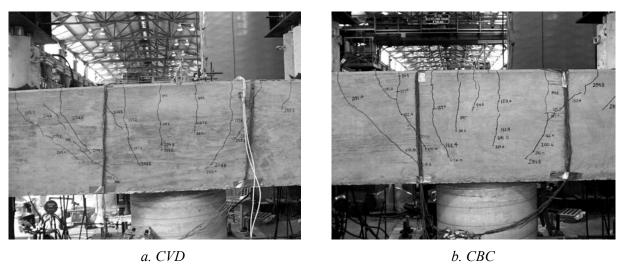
CVD1 and CBC1 Crack Patterns on South Sidewall at Factored-Level Load
